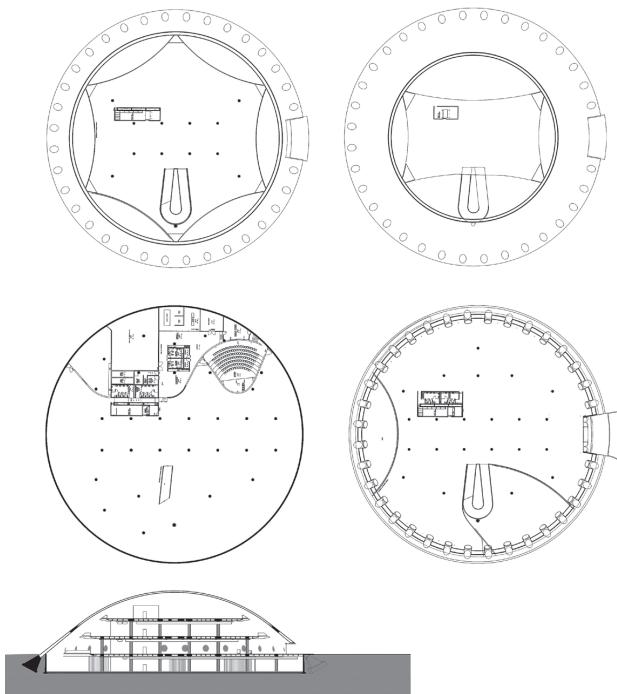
Plans of the four floors and section through the access door - restoration design executed by architect Paulo Mendes da Rocha and the MMBB Architects office. Source: MMBB Architects, 1998 / Figura 6. Planta de los cuatro niveles y corte desde la puerta de entrada del proyecto de una refacción conducida por el arquitecto Paulo Mendes da Rocha y por el Escritorio MMBB Arquitectos. Fuente: MMBB Arquitectos, 1998.
